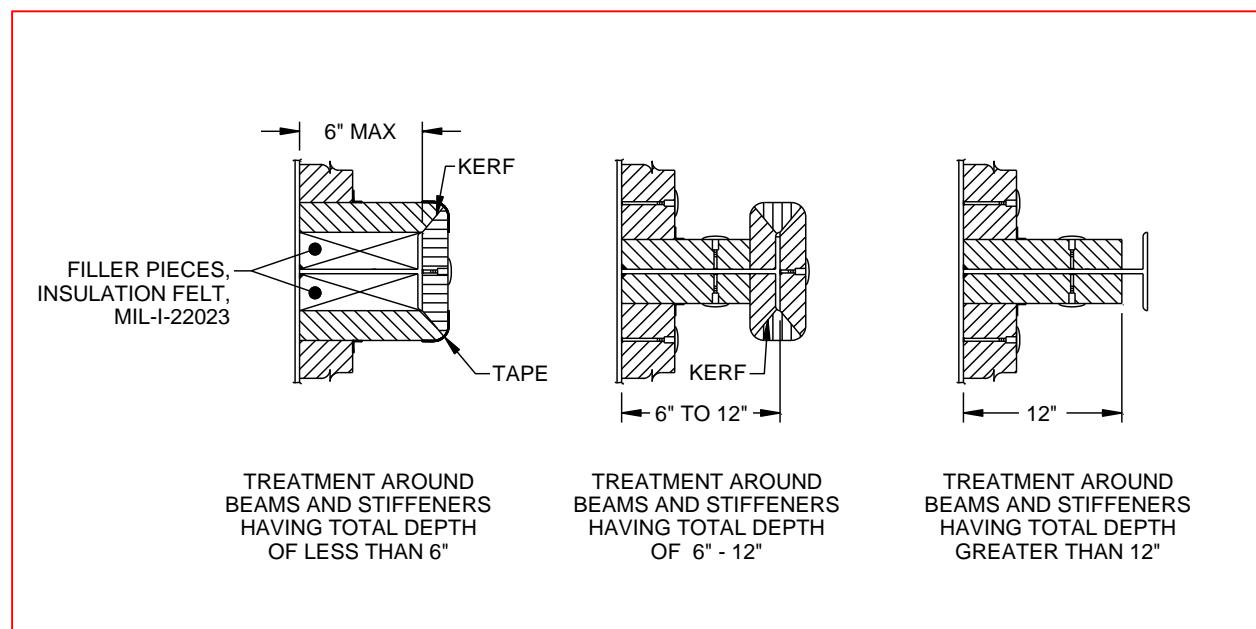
Installation of fibrous-glass thermal insulation on beams and stiffeners.
